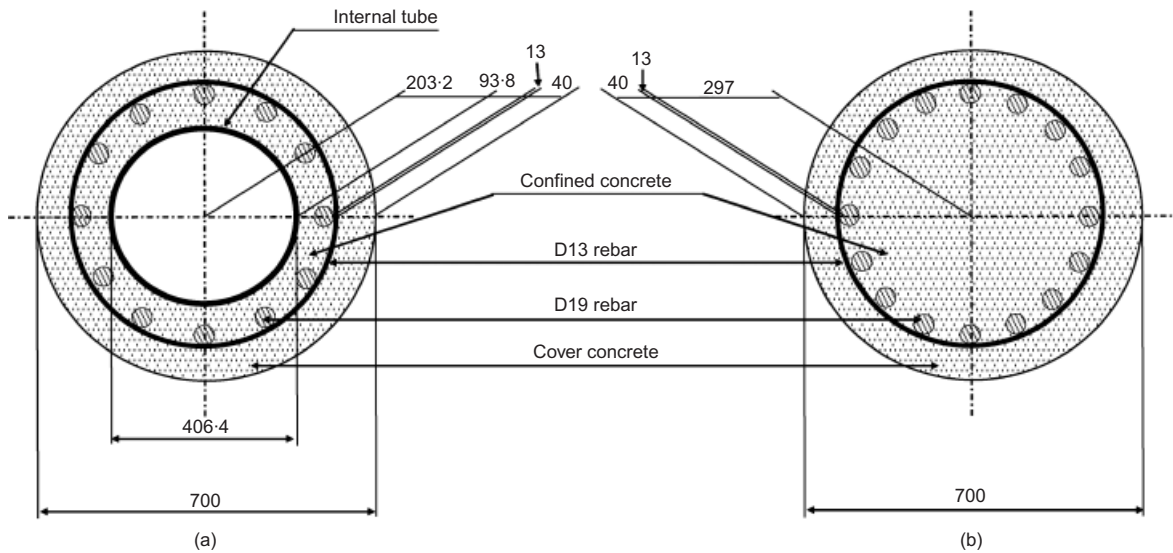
Cross-sectional dimension of designed column (mm): (a) ICH RC column; (b) solid RC column
